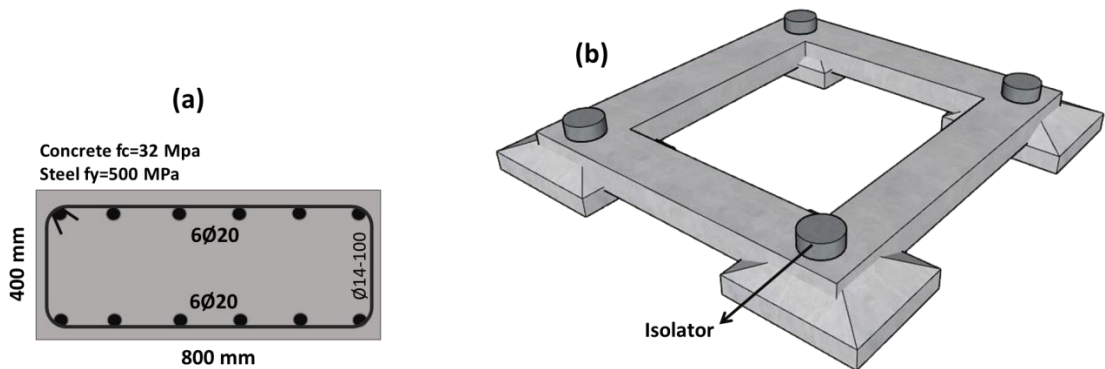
(a) Detail of the reinforced concrete ring beam. (b) Sketch of the foundation system for the isolated tower.
